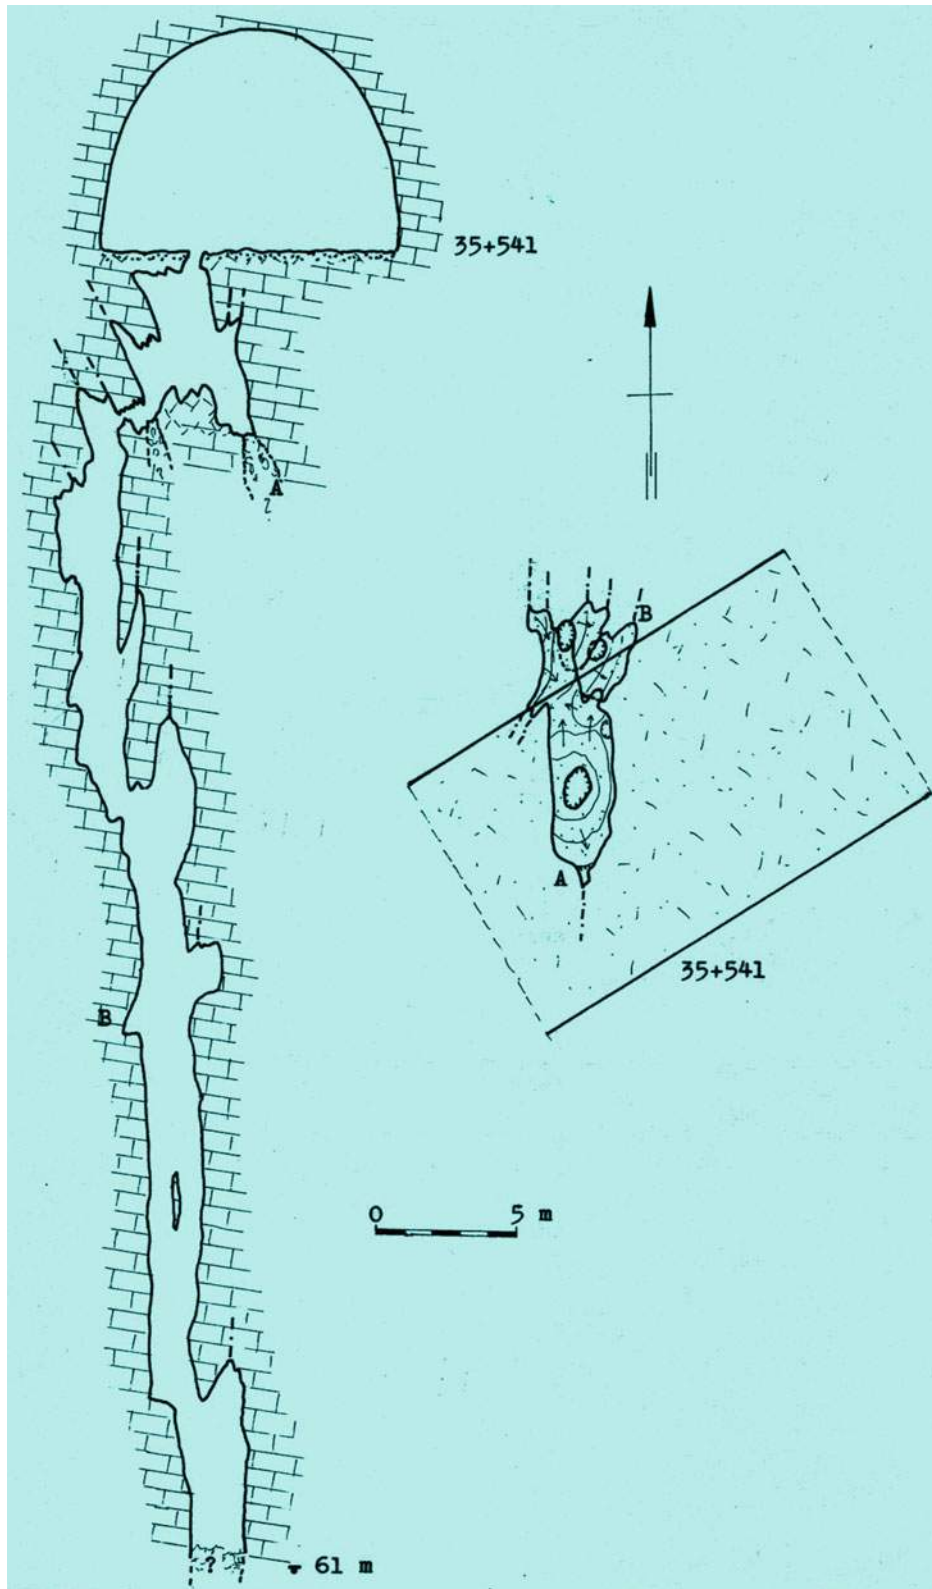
Profile and plan of cavern at km 35 + 541 in Sleme Tunnel
